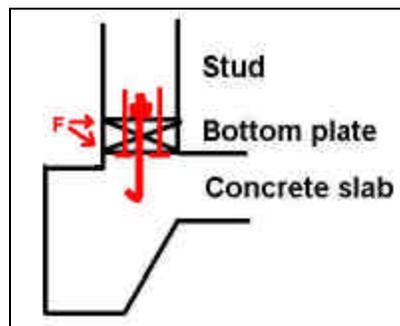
Typical wall cross section on concrete slab foundation showing a bottom plate bolted to the foundation and straight-nailed into the wall stud. Connections and failure points ("F") are in red.
